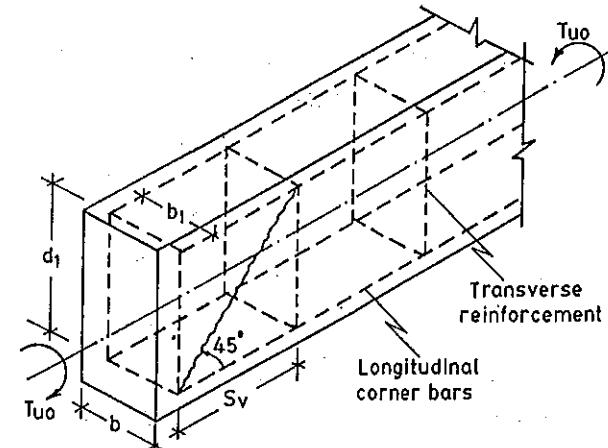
Space Truss Model for Torsion in R.C.C. Beams
